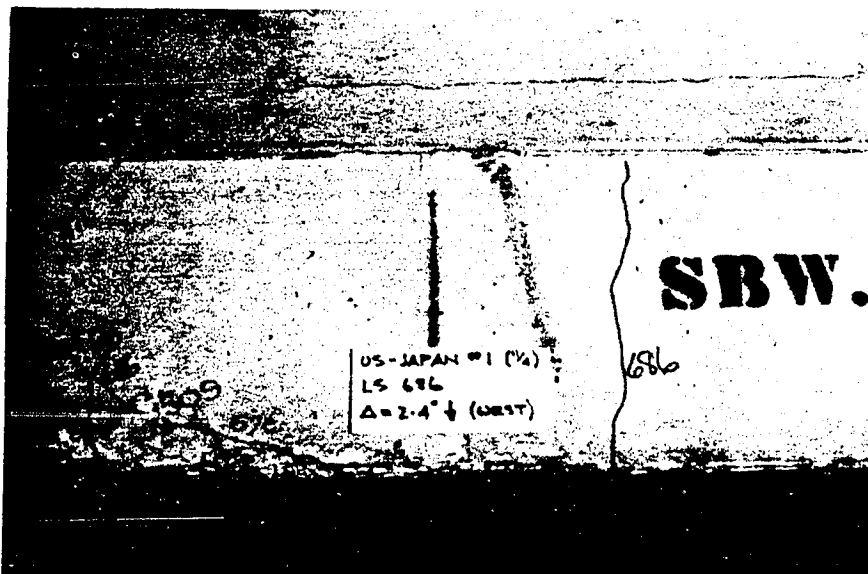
Vertical cracks in transverse beam at D2.4, interior prototype
